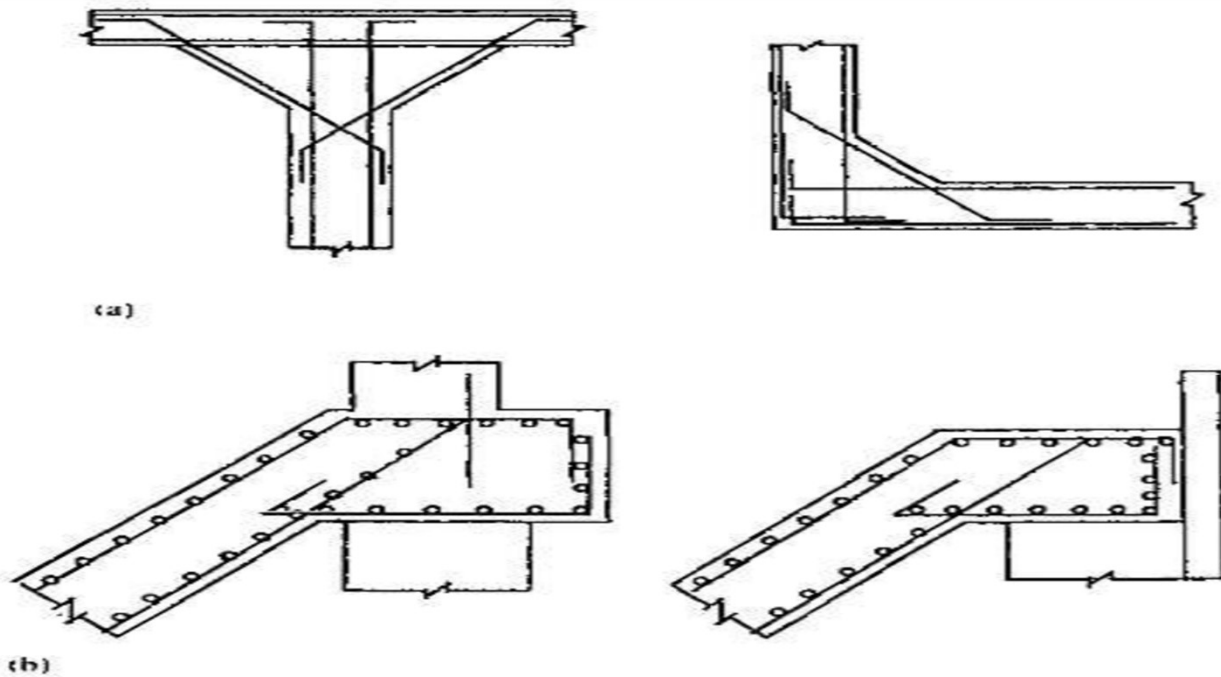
Typical details for concrete silo: (a) reinforcement position at intersecting walls, (b) typical details of hopper-supporting beams.
